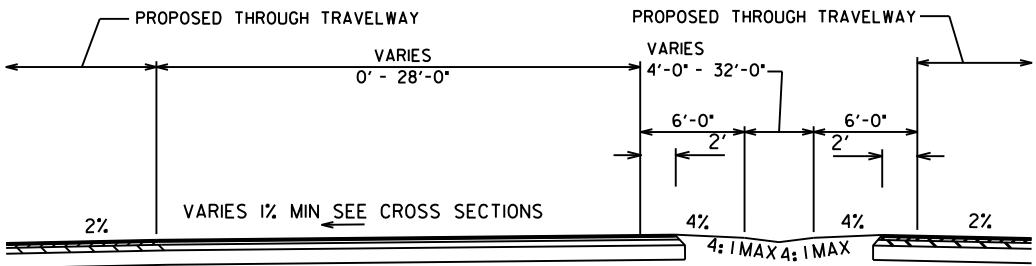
DETAIL FOR RURAL SHOULDER 5-LANE SECTION TS-2
